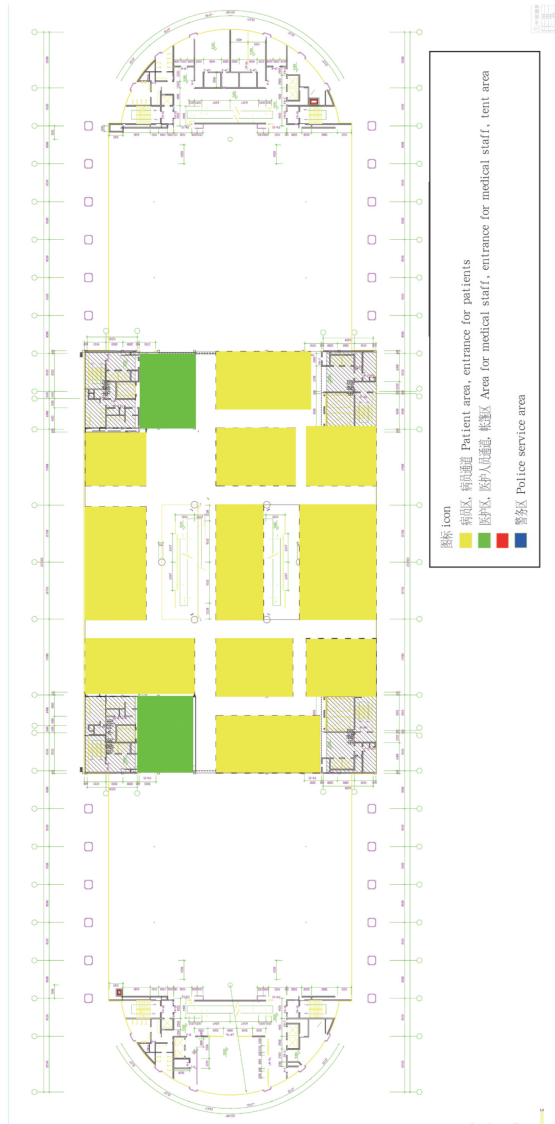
Plan of Zall (Jiangnan Wuzhan) Fangcang Shelter Hospital Floor 2
